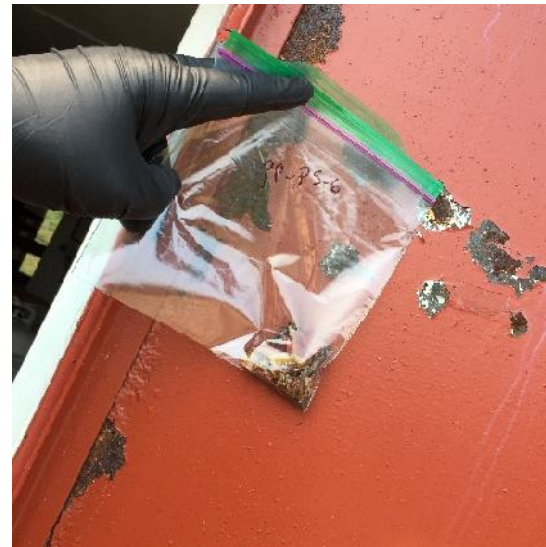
View of paint sample PP-PS6, wall, cabin exterior.
